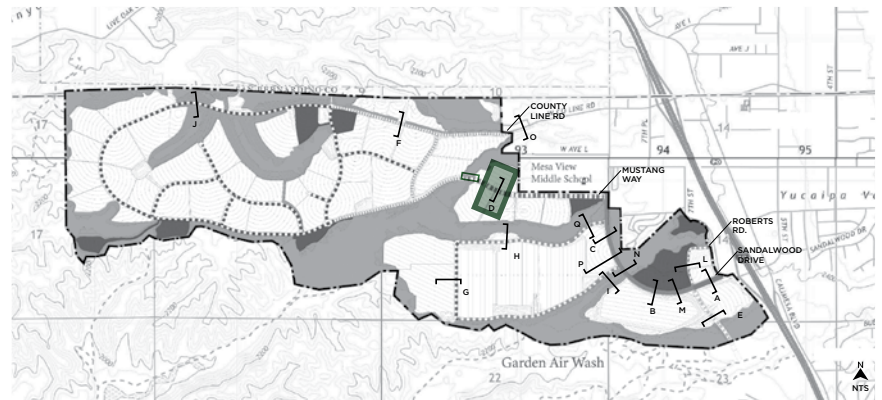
ENLARGEMENT SECONDARY STREET SECTION D
